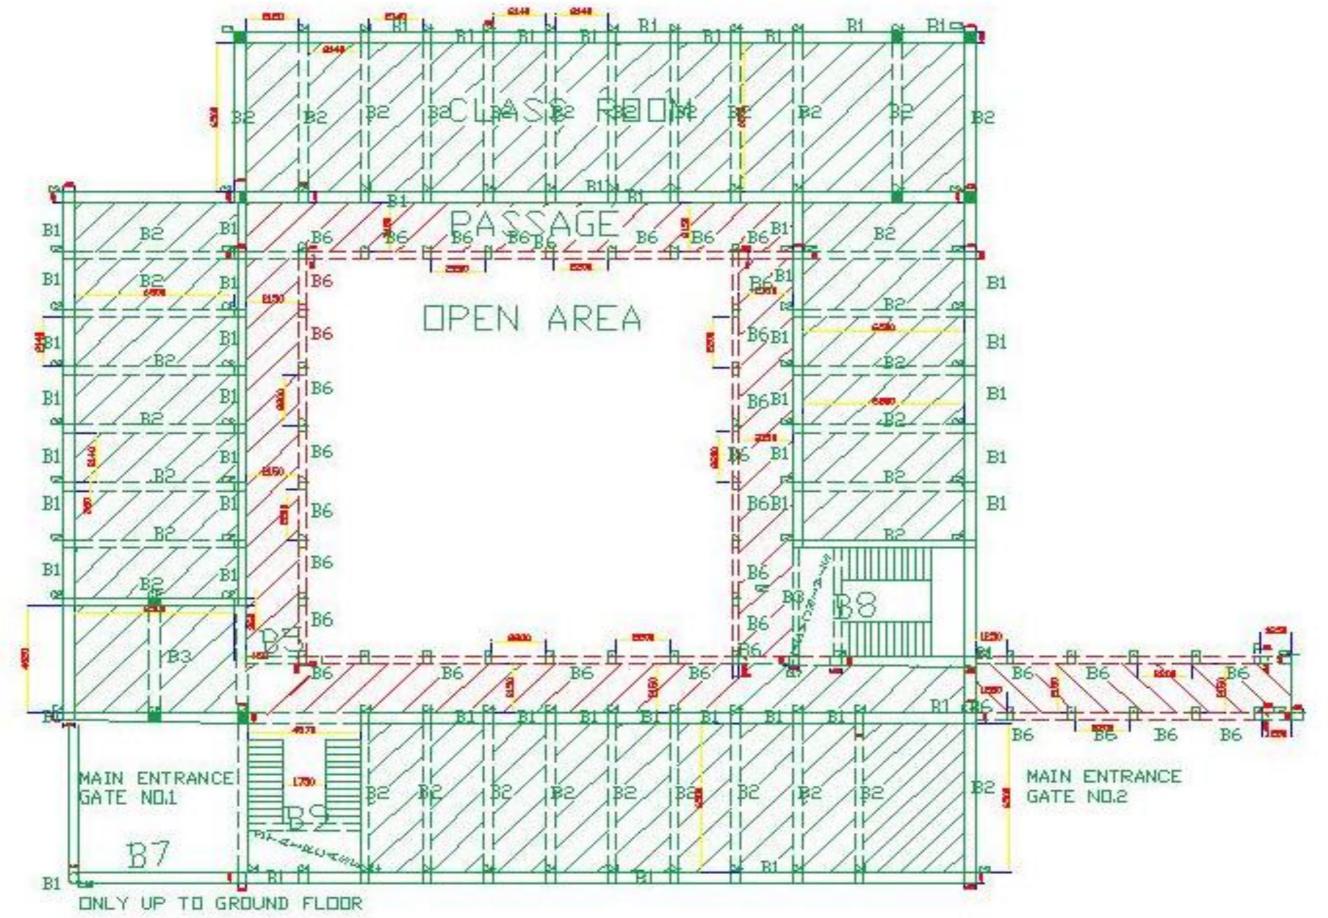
Structural Failure in RCC member of Block A (Marked in Red Colour)
